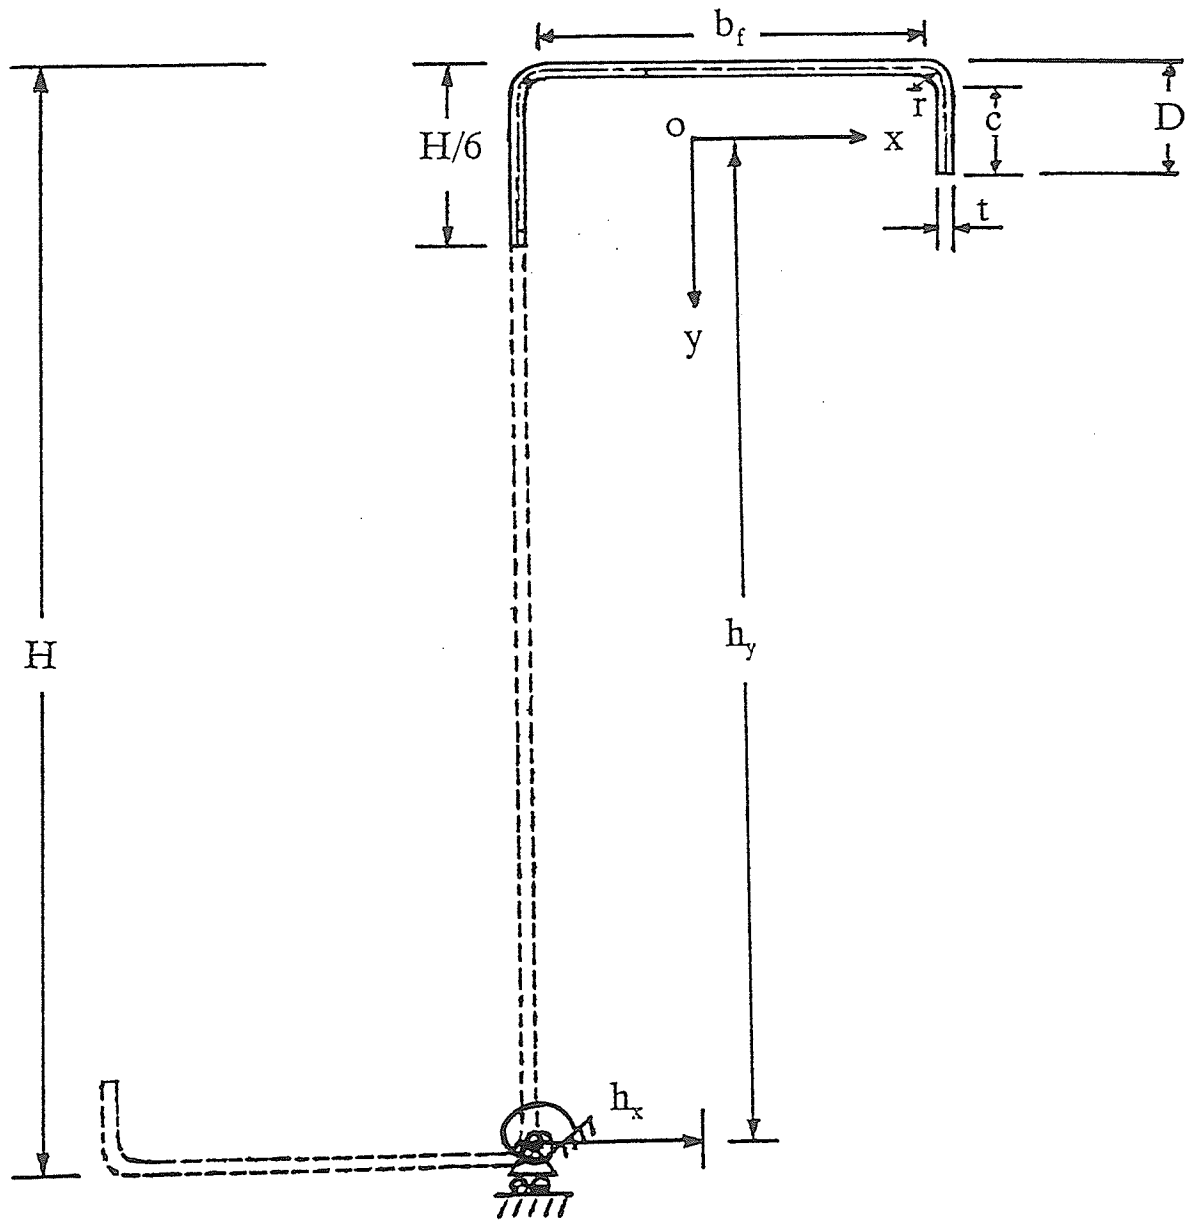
Theoretical Model of an Equivalent Column for Cold-Formed Steel Z-Section Beam
